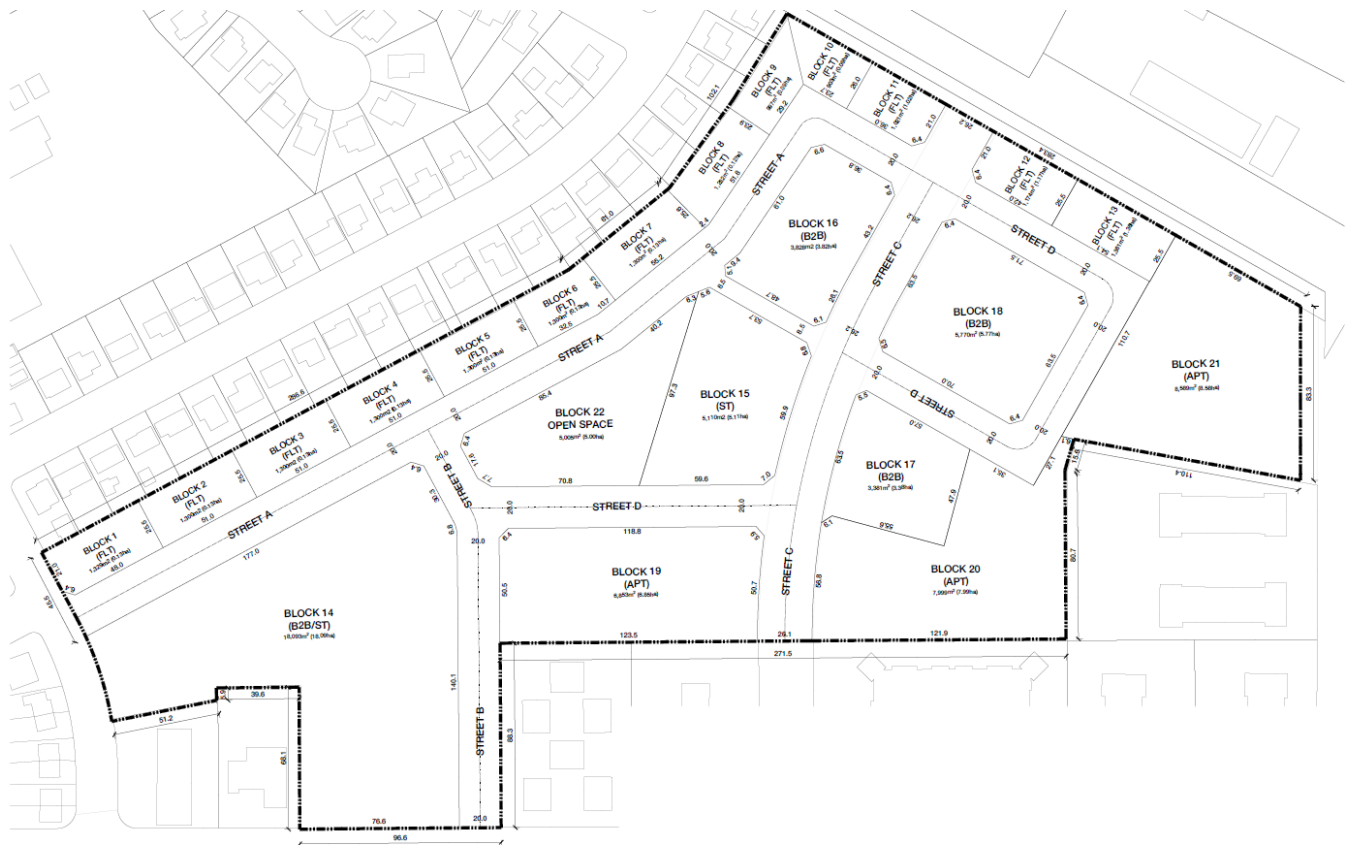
Proposed Draft Plan of Subdivision Indicating the Development Blocks
